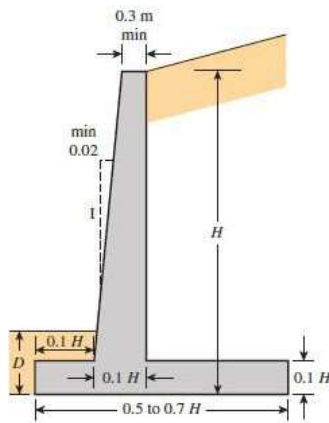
Cantilever wall dimensioning (Das, 2019)
